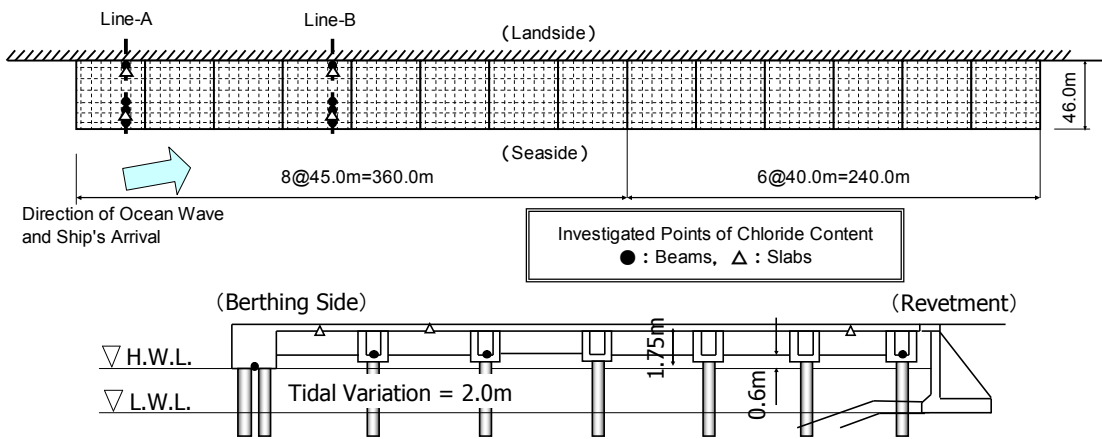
Structural Diagrams of Jetty-D (OPC concrete)
